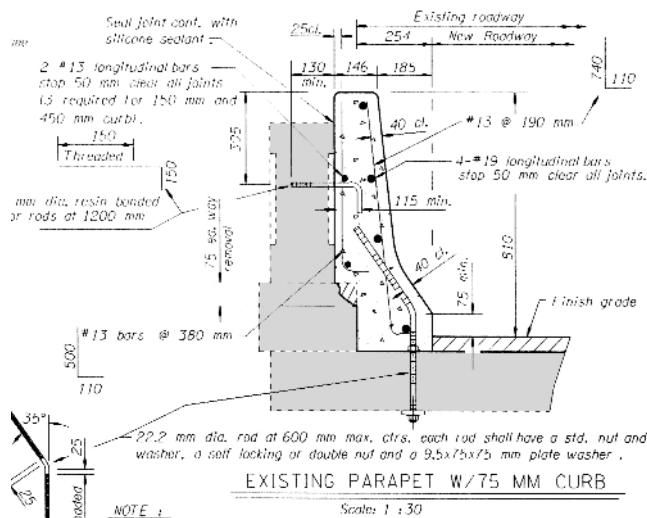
Type F Retrofit of Existing Bridge Rail (shown in shade clarity)
